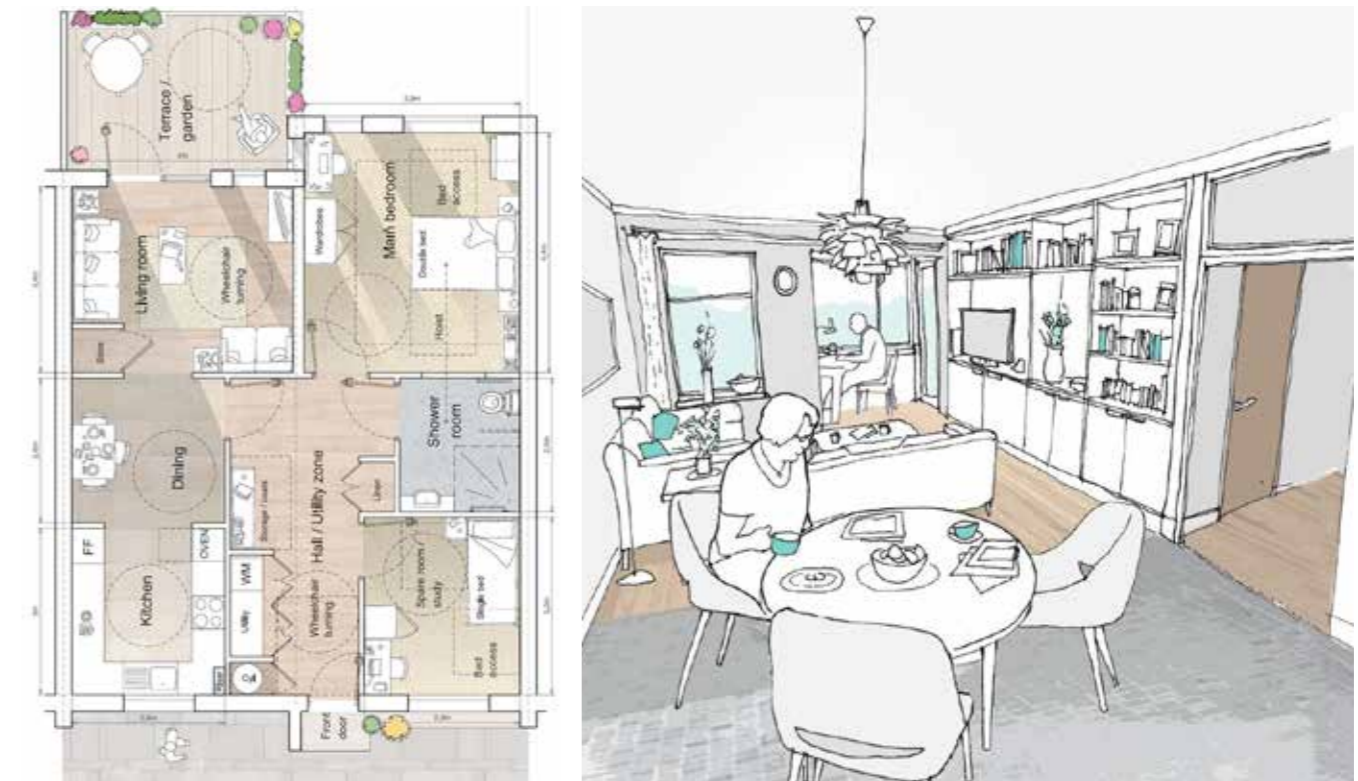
Retirement Apartment Example (Illustration & Layout), Deck Access, Lawfield, York © BDP
